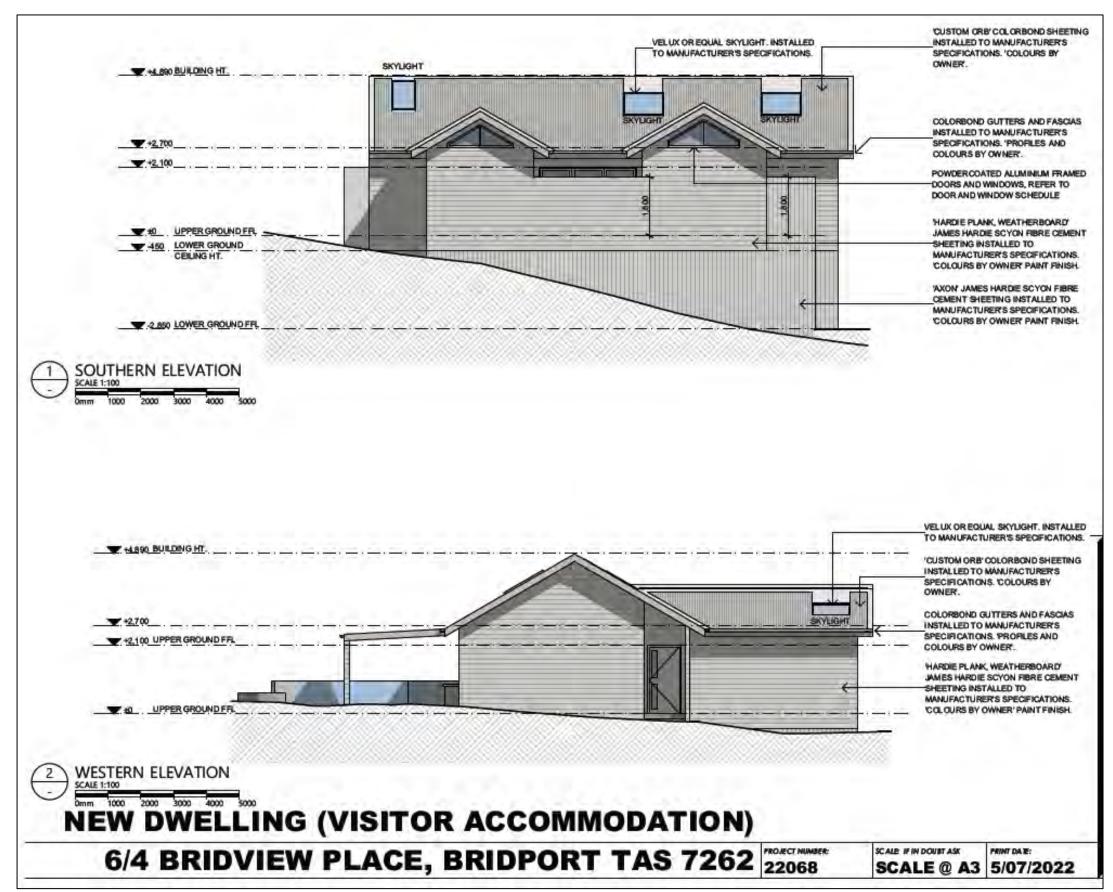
Western and Southern elevations of proposed visitor accommoation unit (source: Plans to Build 2022)
